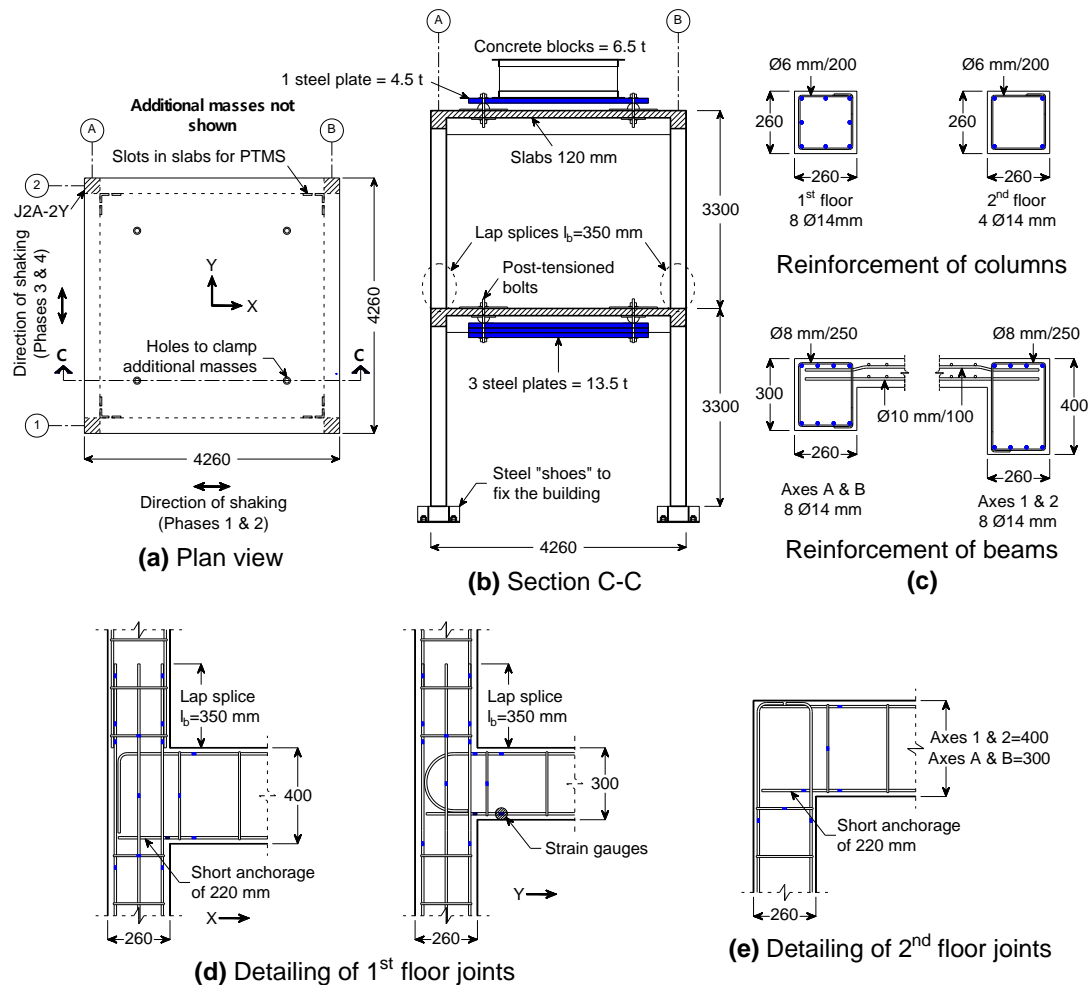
General geometry and reinforcement detailing of BANDIT building (units: mm), partially adapted from Garcia et al. (2014a)
